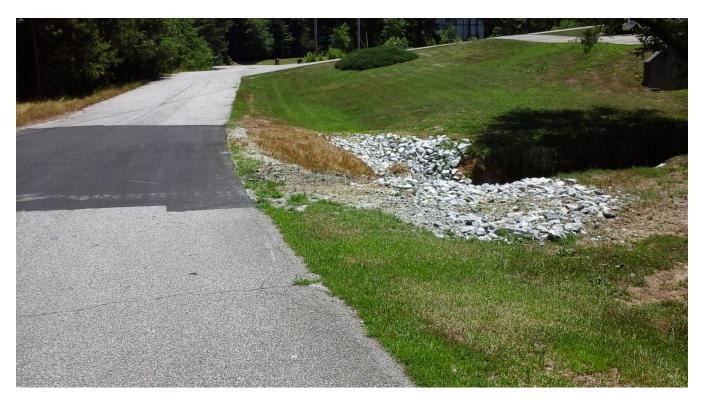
The roadway was repaired, repaved, and opened for traffic. (Work completed 01/14/2016)
